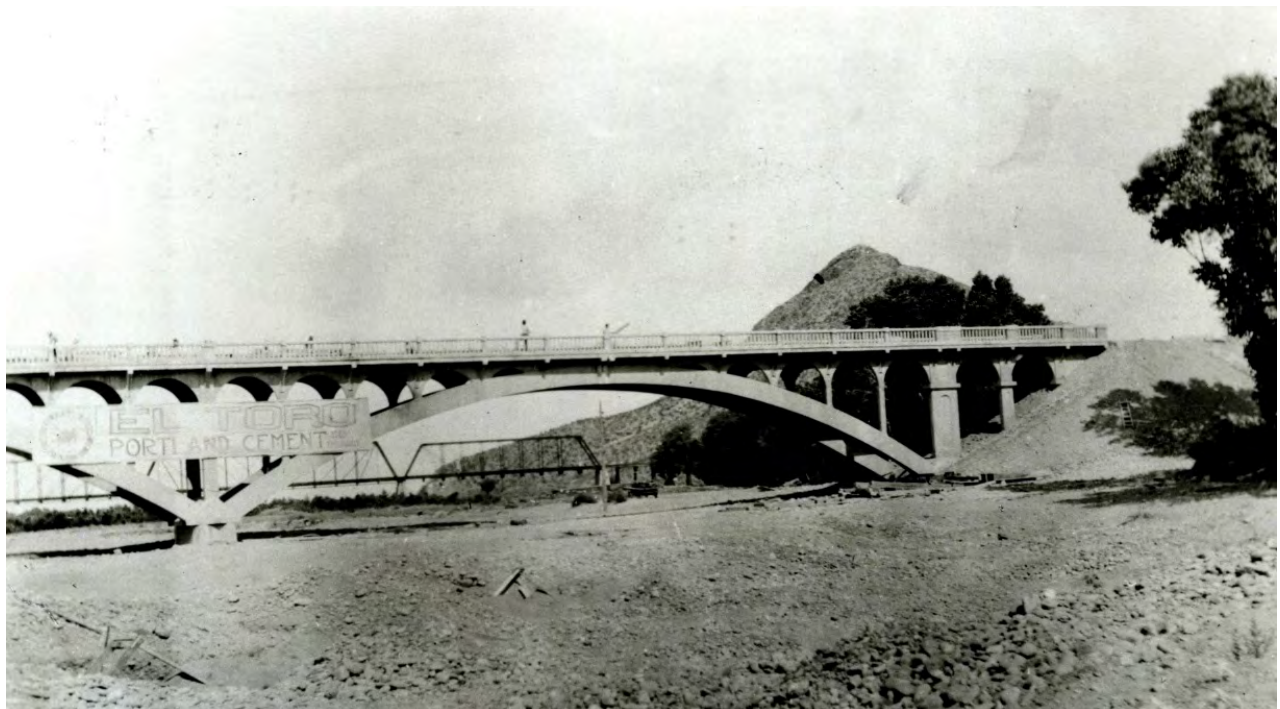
Ash Avenue Bridge, ca. 1913. Railroad bridge and Tempe Butte in background. Note dry Salt River. Source: Special Collections, Arizona State University, Tempe, Arizona.
